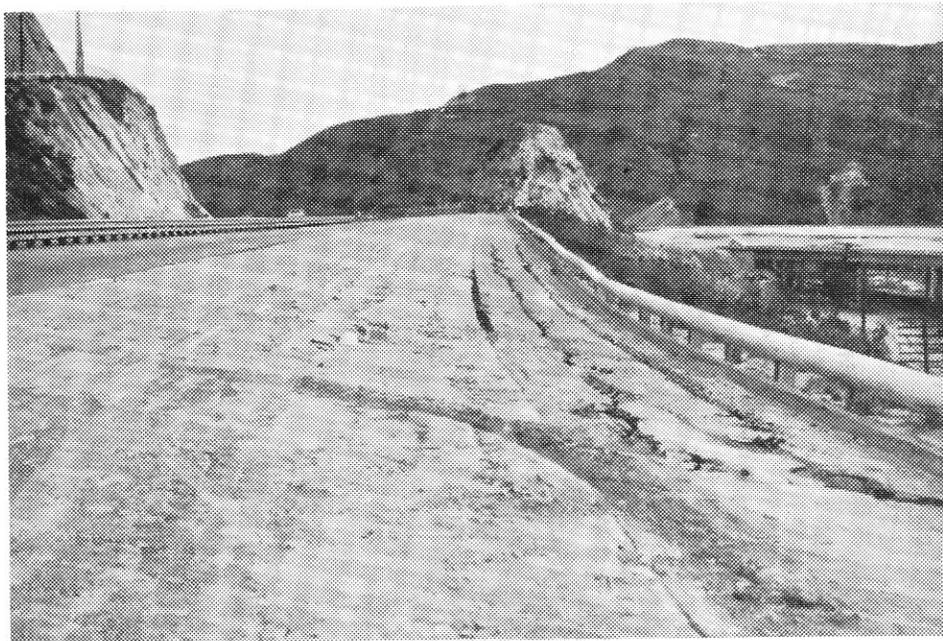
Longitudinal cracking in pavement due to lateral movement at top of cantilever retaining wall. Pavement has been broken mechanically for removal.
